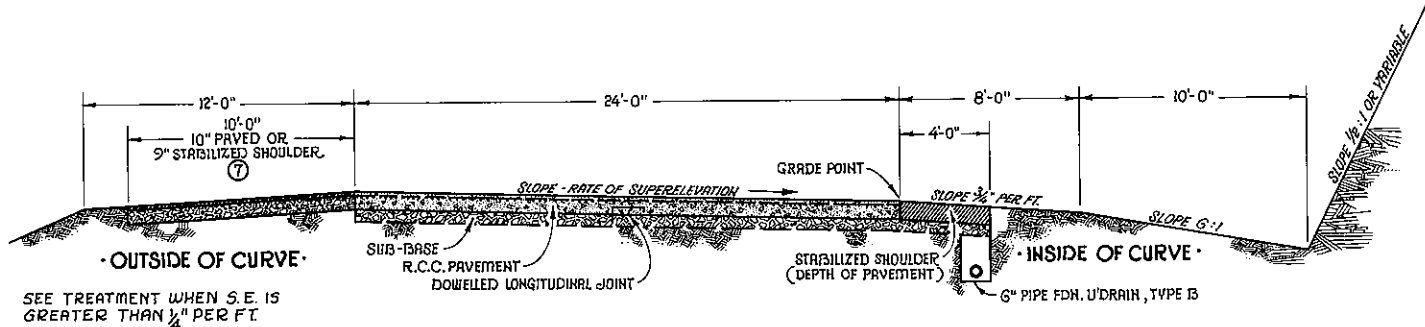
DETAILS TO BE ALTERED AS REQUIRED FOR FLEXIBLE TYPE PAVEMENT.
